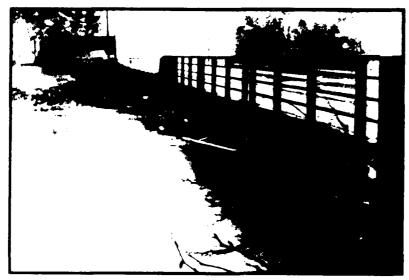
Looking at the upstream side of Prewenton Road bridge (U.S. Route II), stream mile 1.95. Note accumulation of debris that occurs when a tridge is not built high enough to clear high water.
